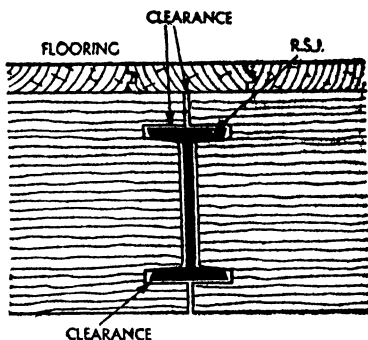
Typical notching when the binder is a rolled steel joist. Bridging joists are shaped to rest closely on the upper surface of the lower flange.
